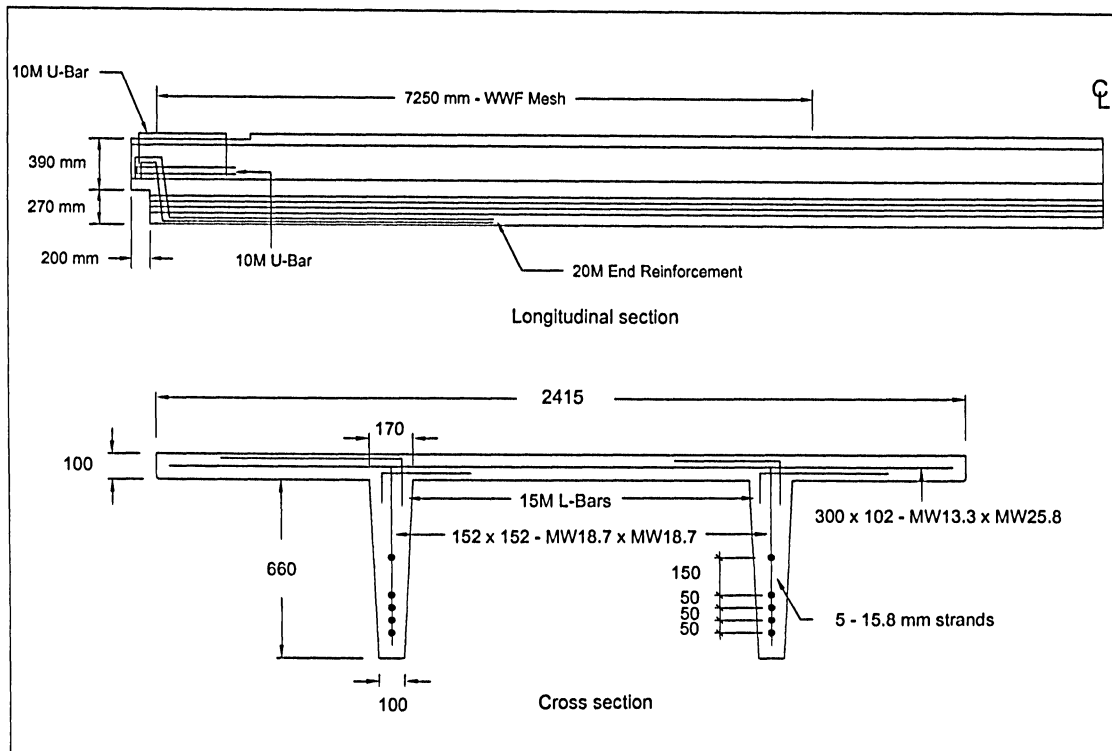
DT-100 girder reinforcement details (Cofini, 2005)
